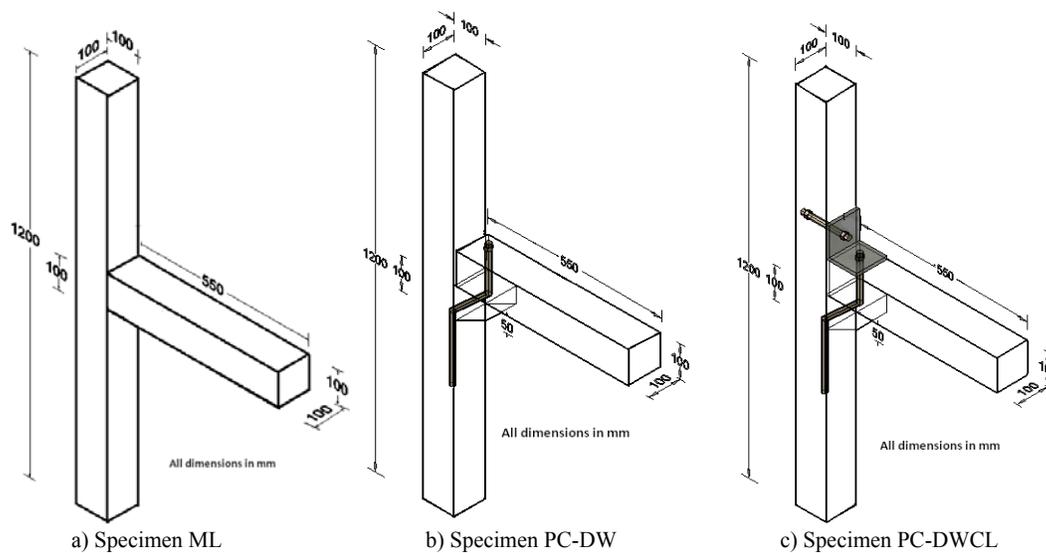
Isometric views of a) Specimen ML, b) Specimen PC-DW and c) Specimen PC-DWCL
